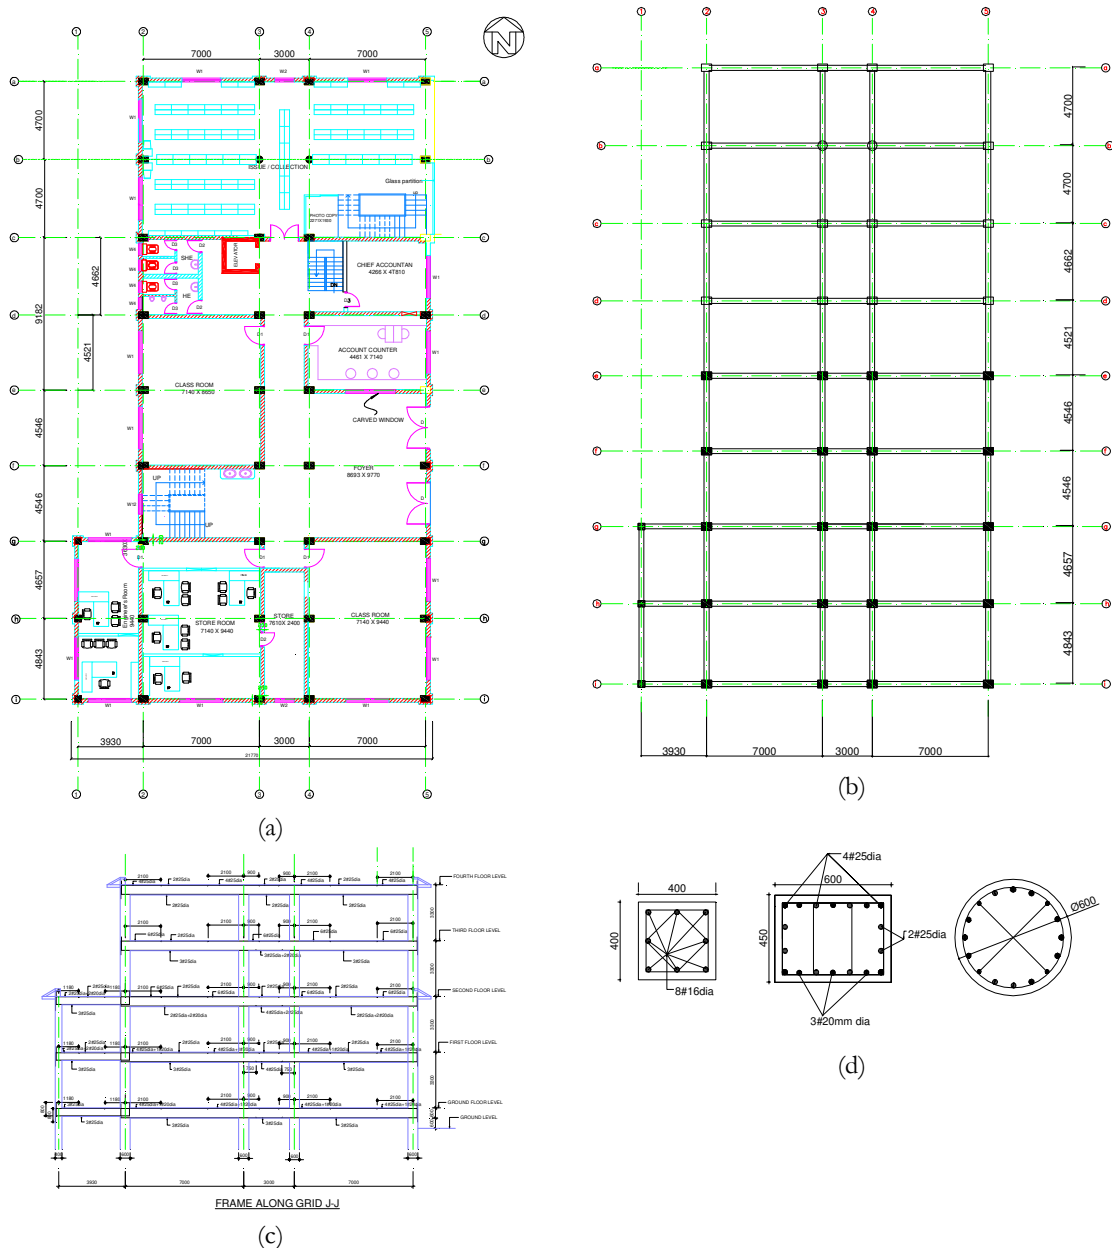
Details and structural layout of the Khwopa College of Engineering Block ‘E’; (a) Typical floor layout, (b) Representative beam and column layout, (c) Reinforcement detailing in beam and (d) Representative detailing in column and its section (all dimensions are in mm)
